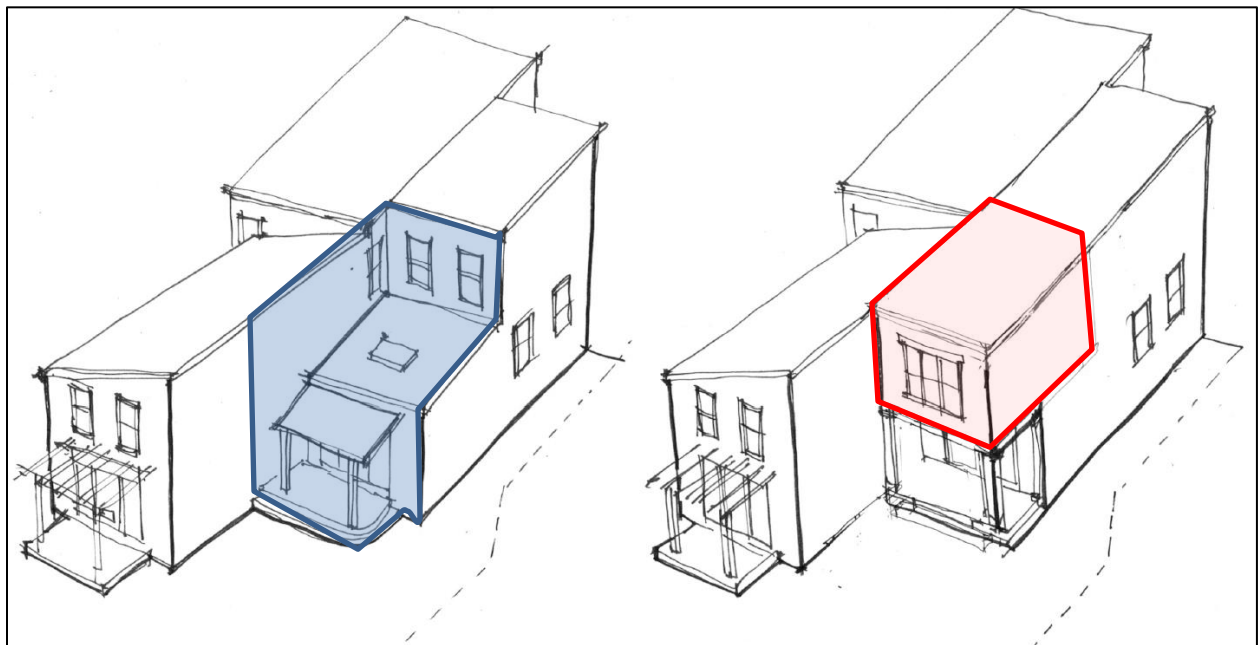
Existing with proposed demolition/capsulation (blue) and proposed second story addition (red)
